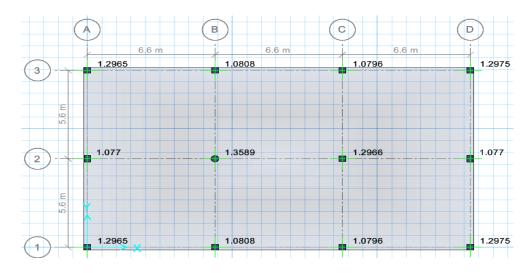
Along shorter side reinforcement(SAFE:EC2, with staggered column)
